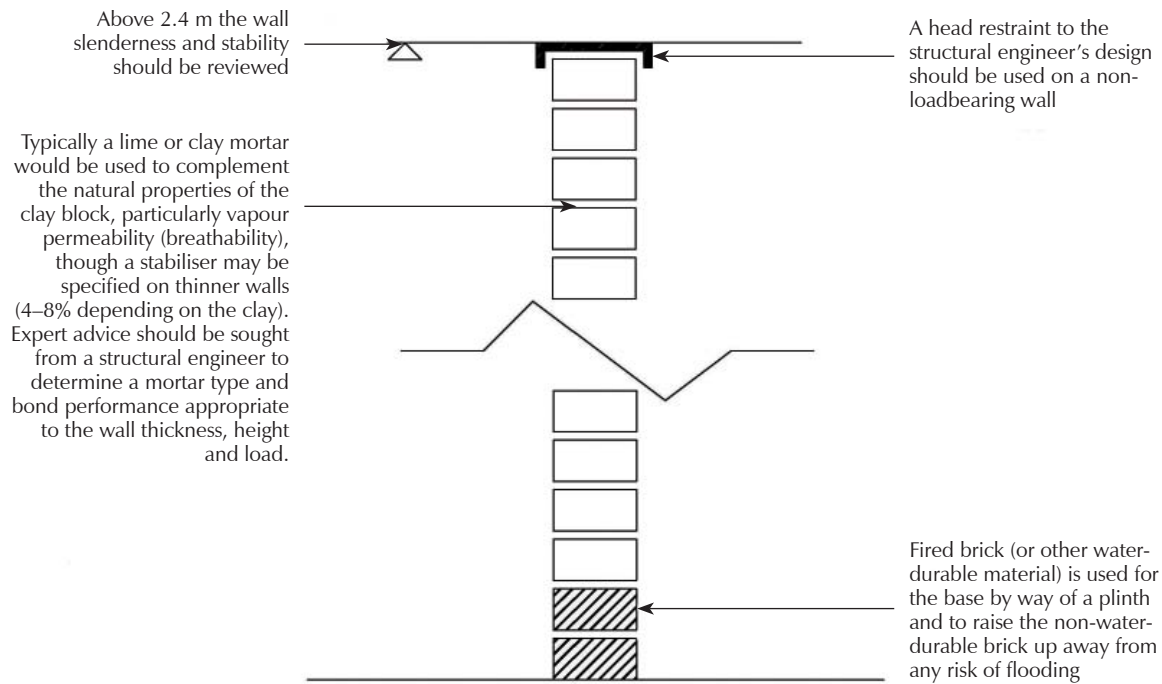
Section detailing of an example unfired masonry construction (similar to solid masonry construction)
